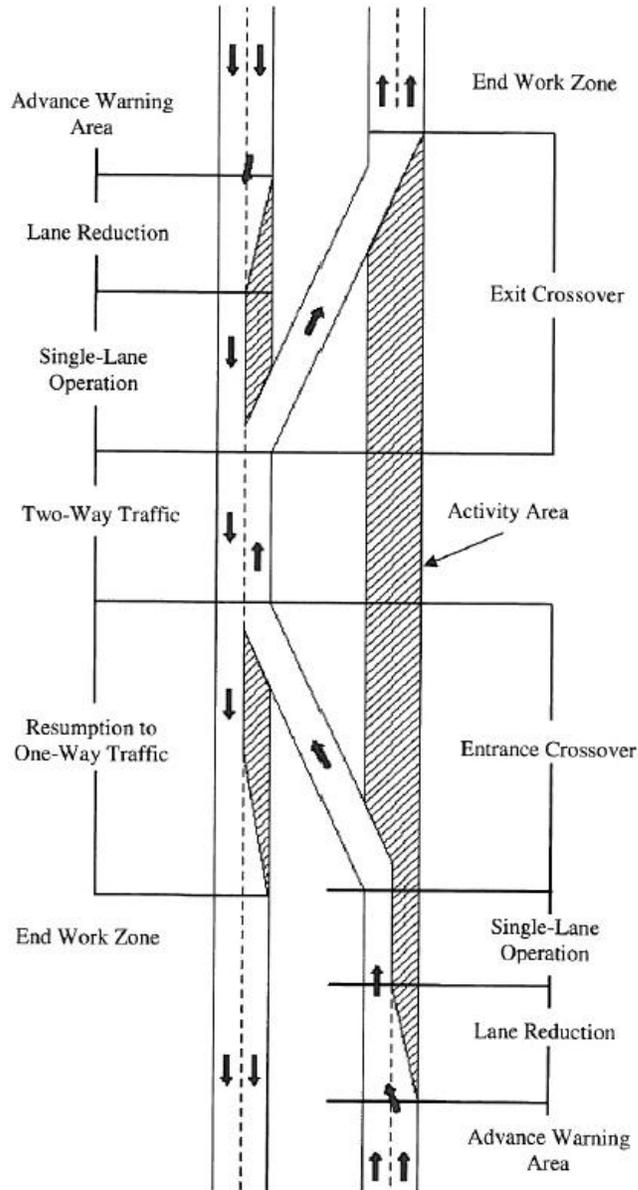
Plan View of Work Zone Utilizing Crossovers (not to scale)
